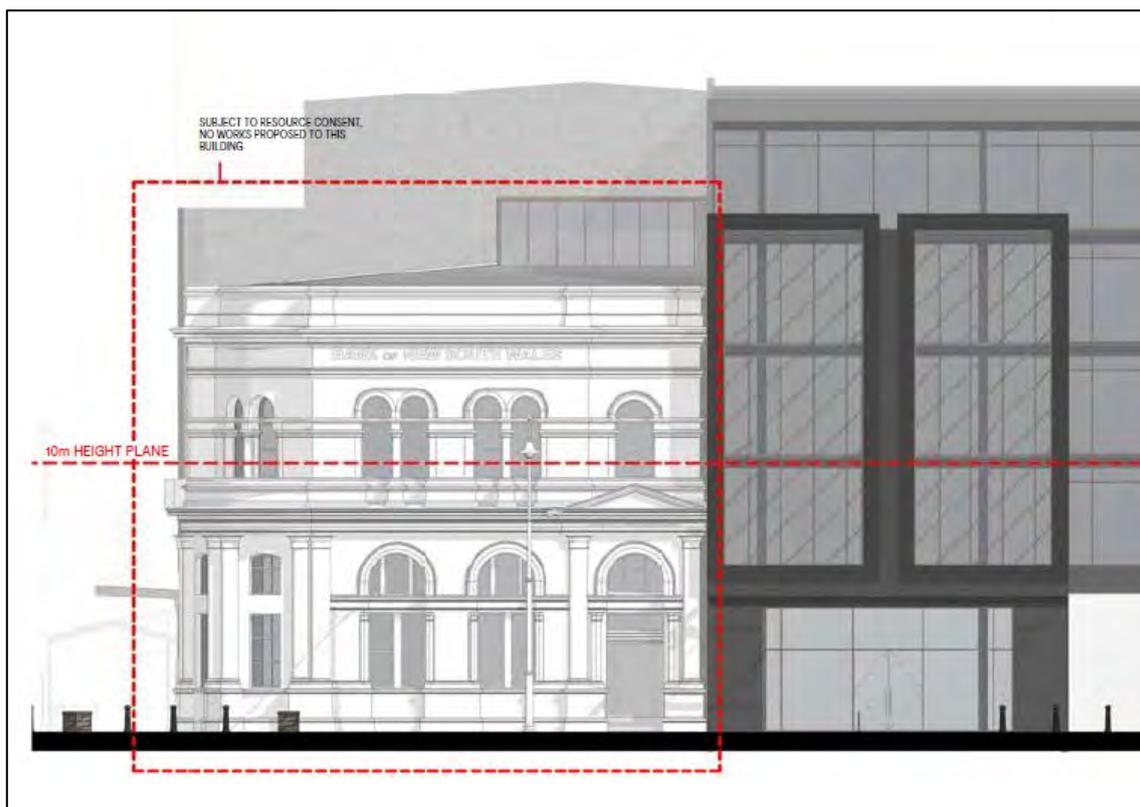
Artist's impression of the proposed development around the Bank of New South Wales on Tay Street (image courtesy of Buchan Group, January 2019).
